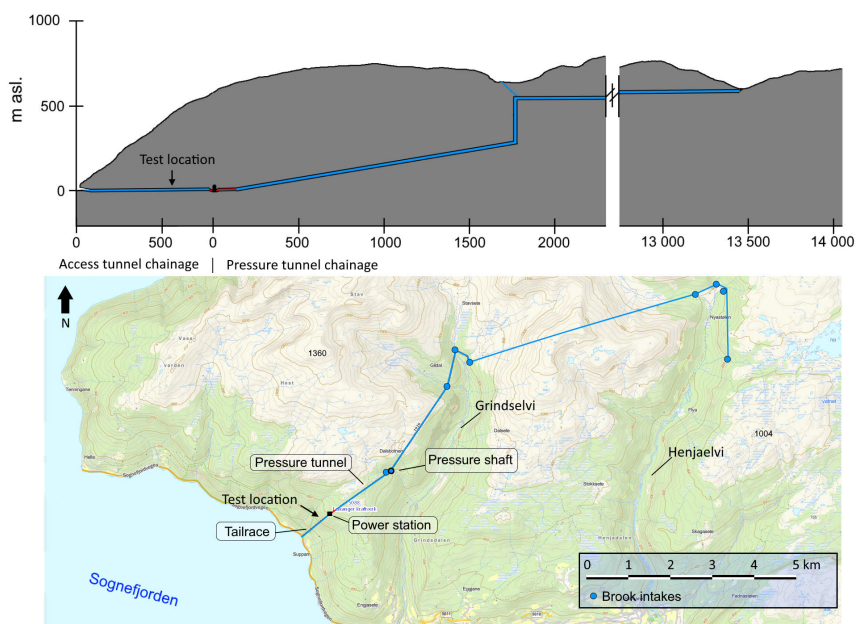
Leikanger HPP long section (top) and plan view (bottom). The long section has been shortened to promote the visibility of the downstream high-pressure section of the water tunnels. Note that plan view and long section have different scales. Background map after NVE (2020)
